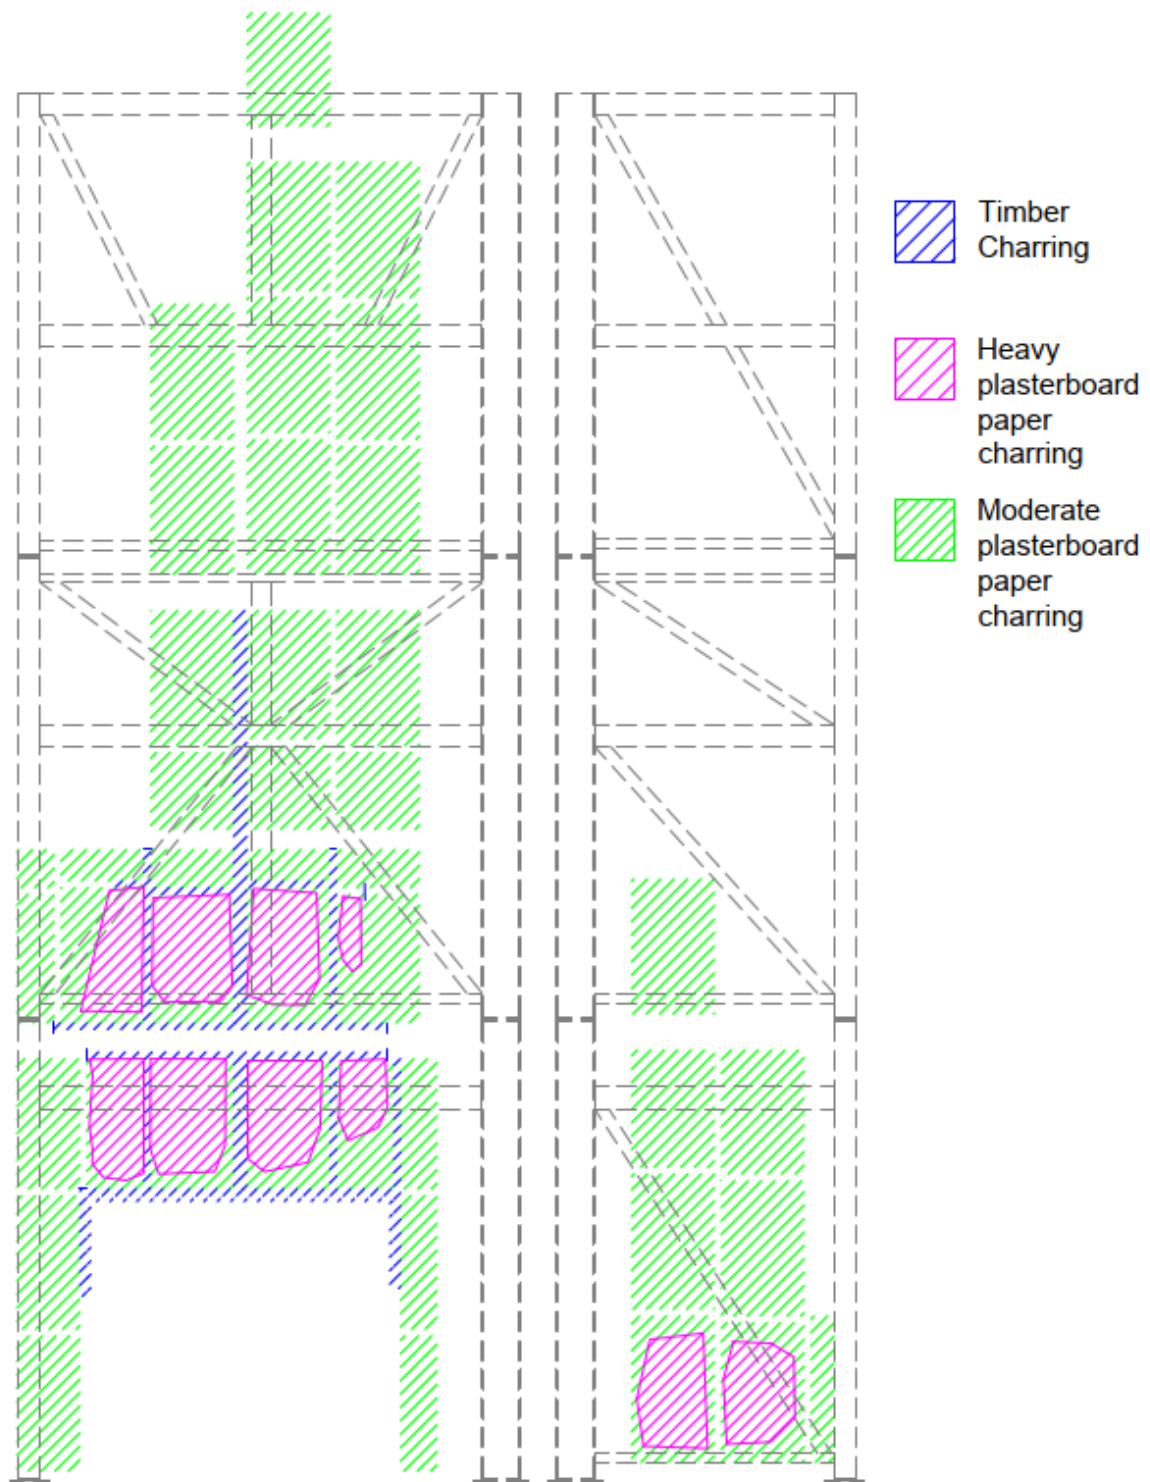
Drawing of the condition of the cladding – timber framing and plasterboard
